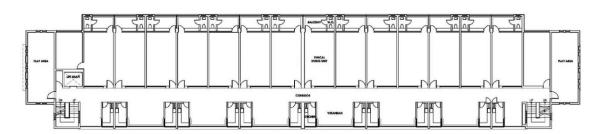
Typical floor plan of Block A of the former Police Married Quarters.
